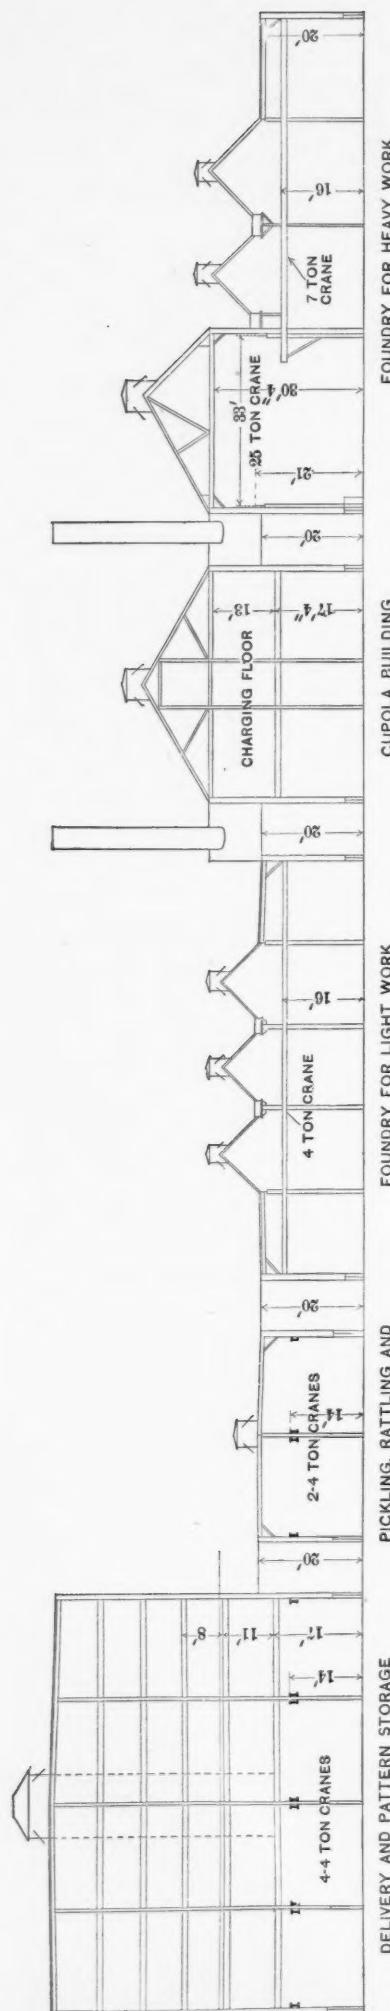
Outline Sketch Showing Sectional End Elevation of Foundry Building.
